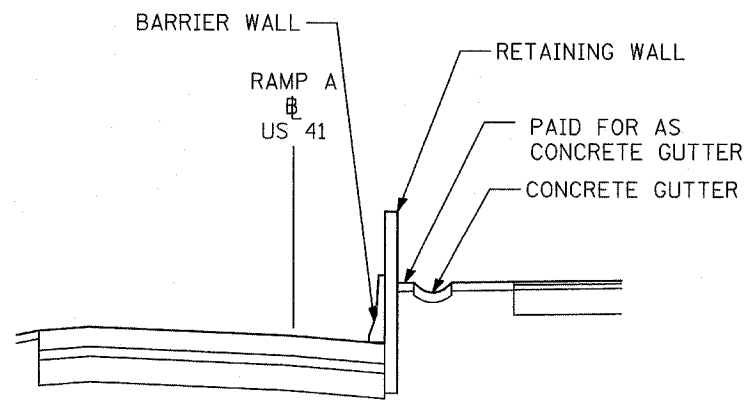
DETAIL OF PROPOSED CONCRETE GUTTER ALONG LIGHT POLE BASE
